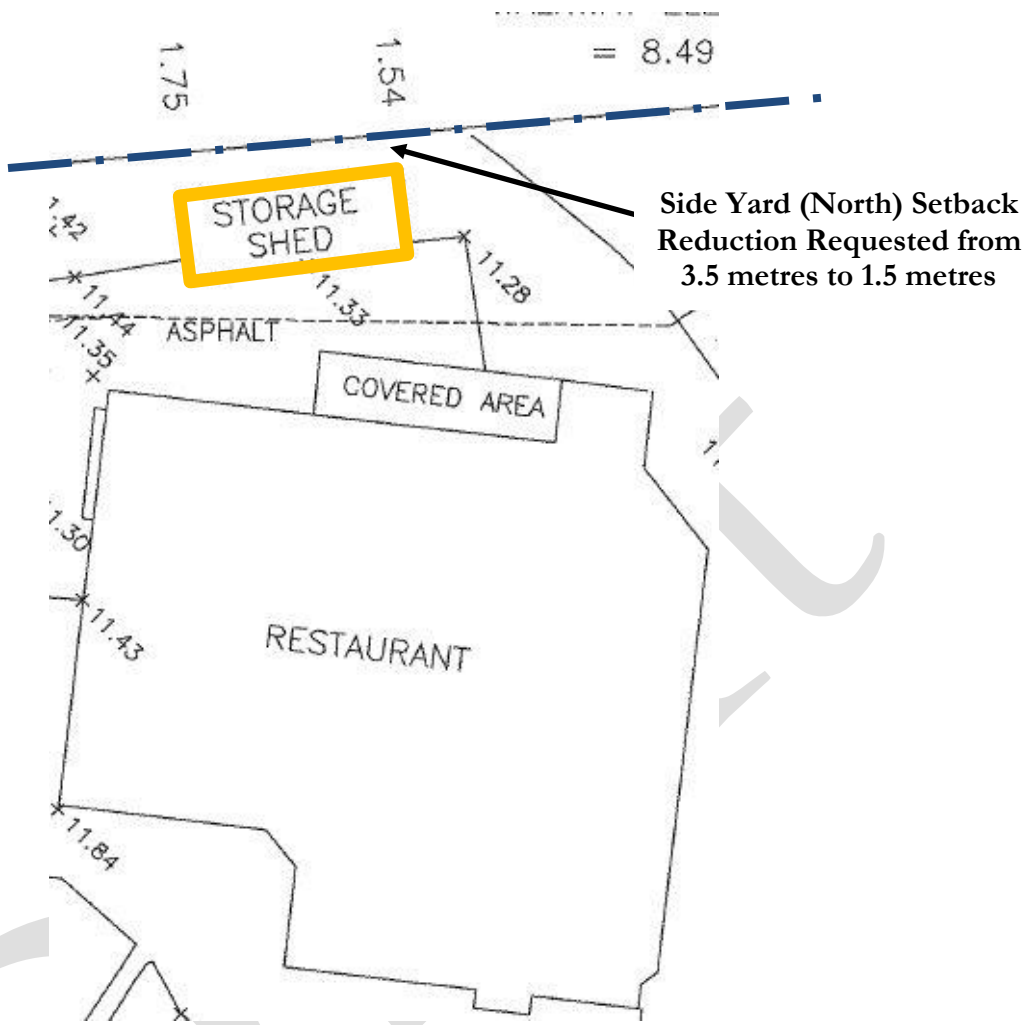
Side Yard (North) Setback Reduction Request for the Existing Storage Shed
